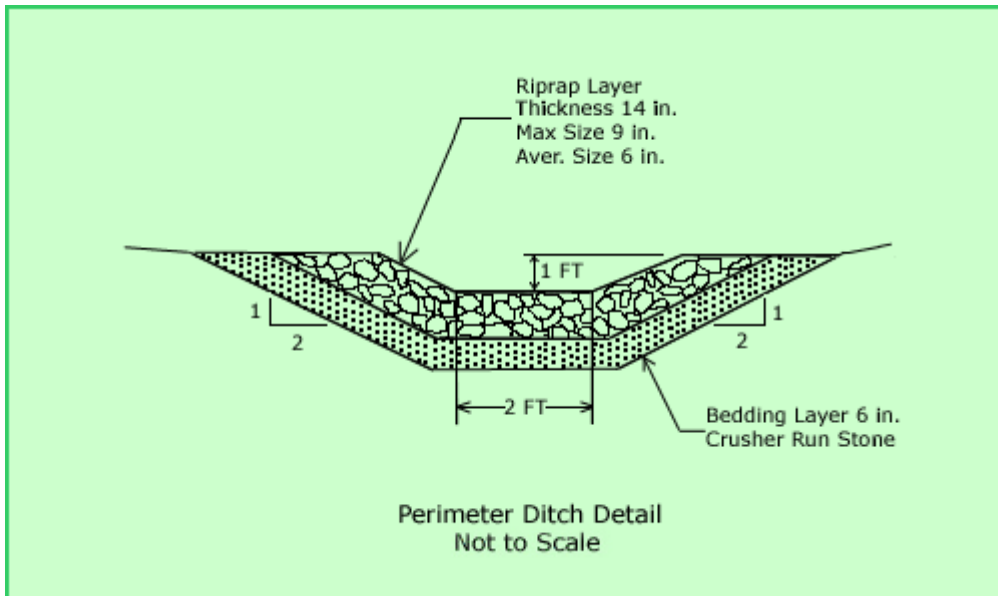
Construction detail of Diversion Channels and Perimeter Ditch
